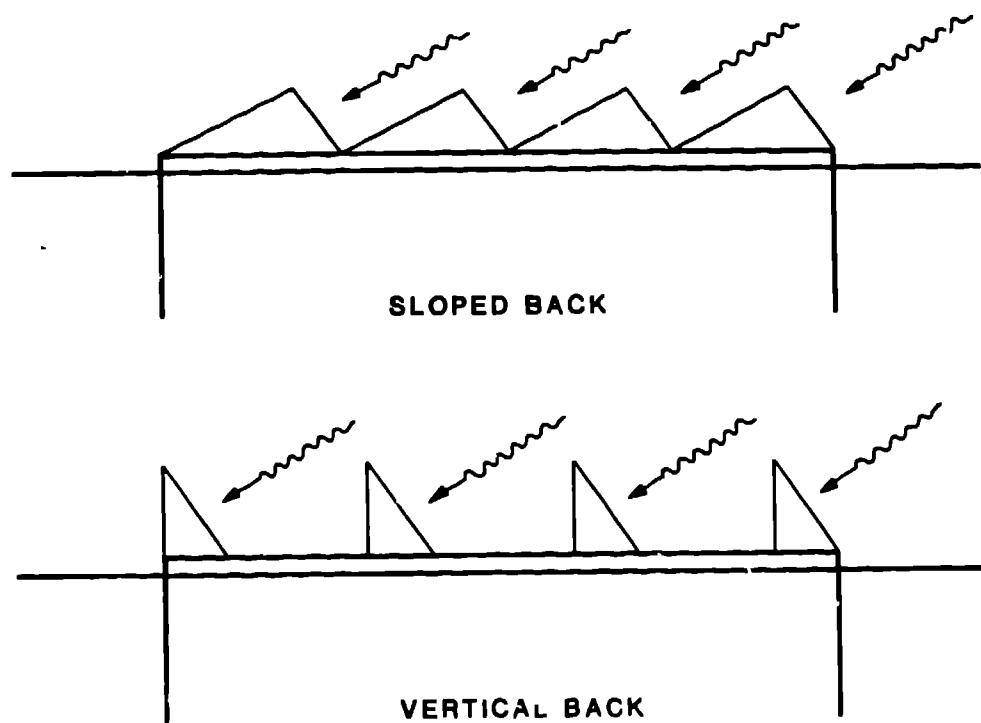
Sloped-back and vertical-back clerestory design concepts.
